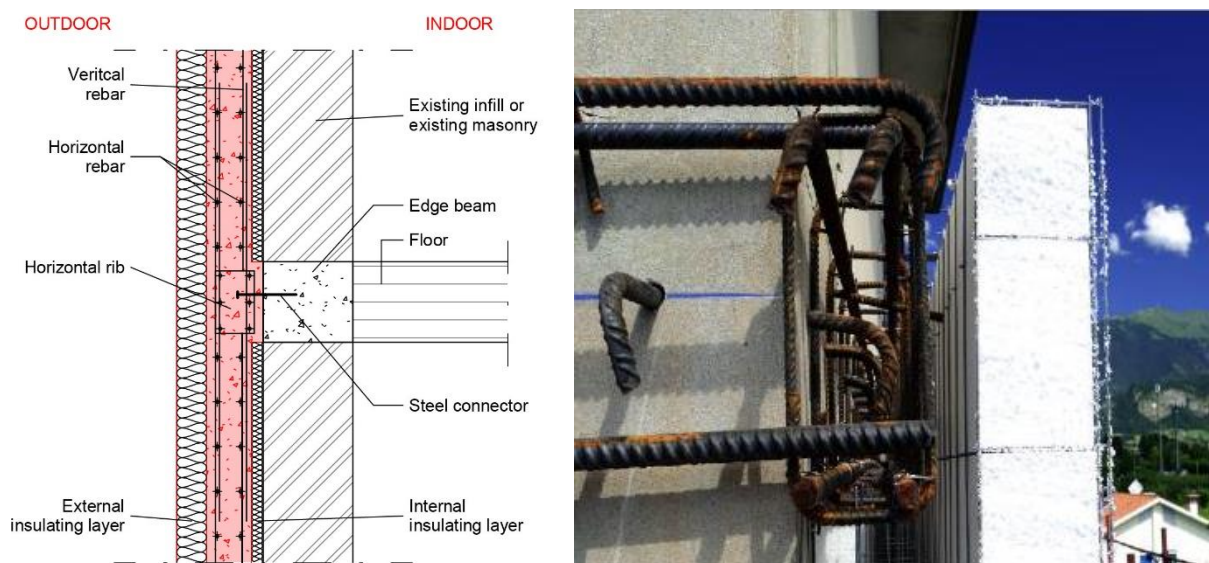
a) Vertical section b) Reinforcement of the concrete rib
